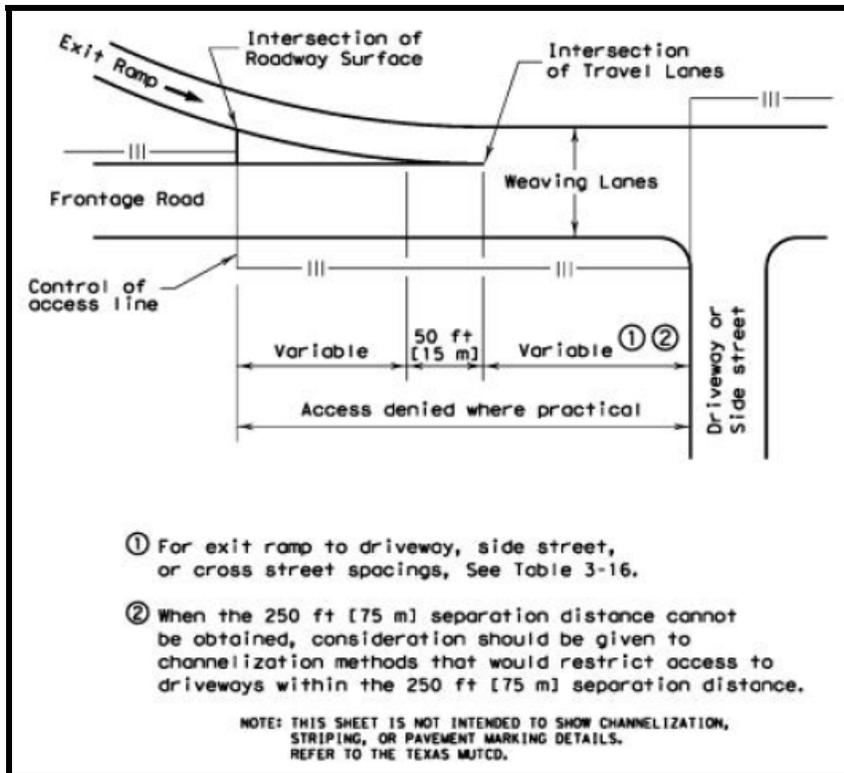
Recommended Access Control at Exit Ramp Junction with Frontage Road (II).
